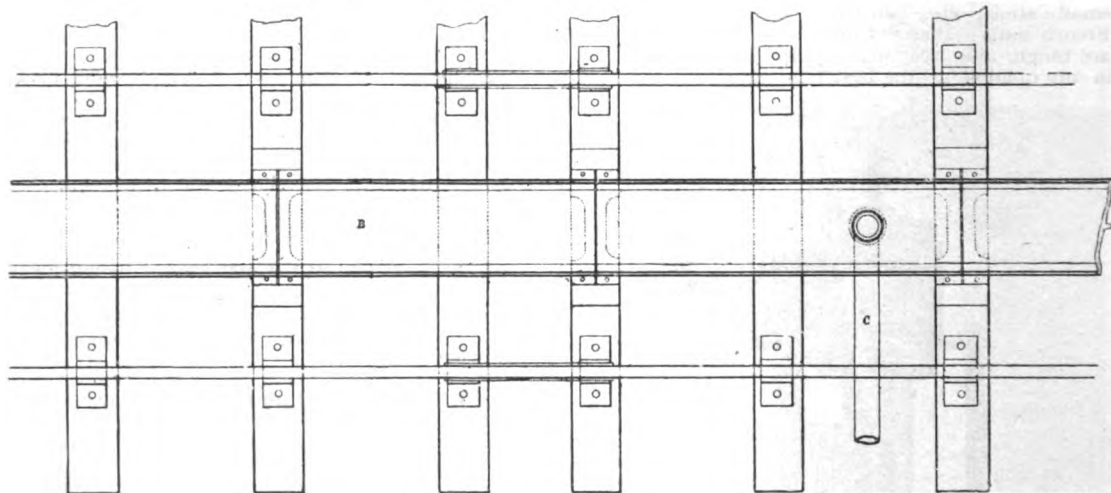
PLAN OF TRACK SHOWING WATER TROUGH.
